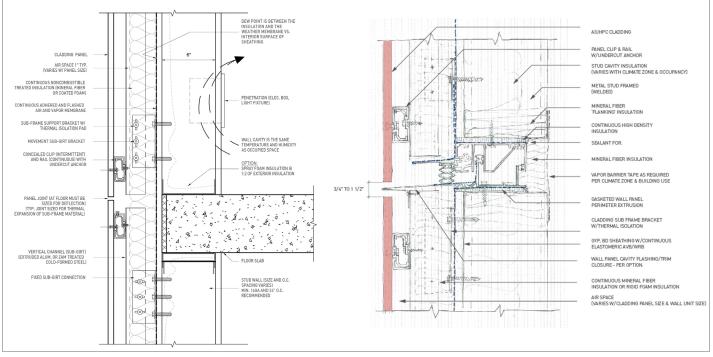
(Left) Field constructed BVDC wall adhering to Straube's perfect wall, (Right) This shows the capacity of prefabricated BVDC systems to accommodate high R-values (R-30 shown here) while fitting A/UHPC panels with standard connecting hardware (including undercut anchors) in a configuration adhering to the principles of Straube's perfect wall.
